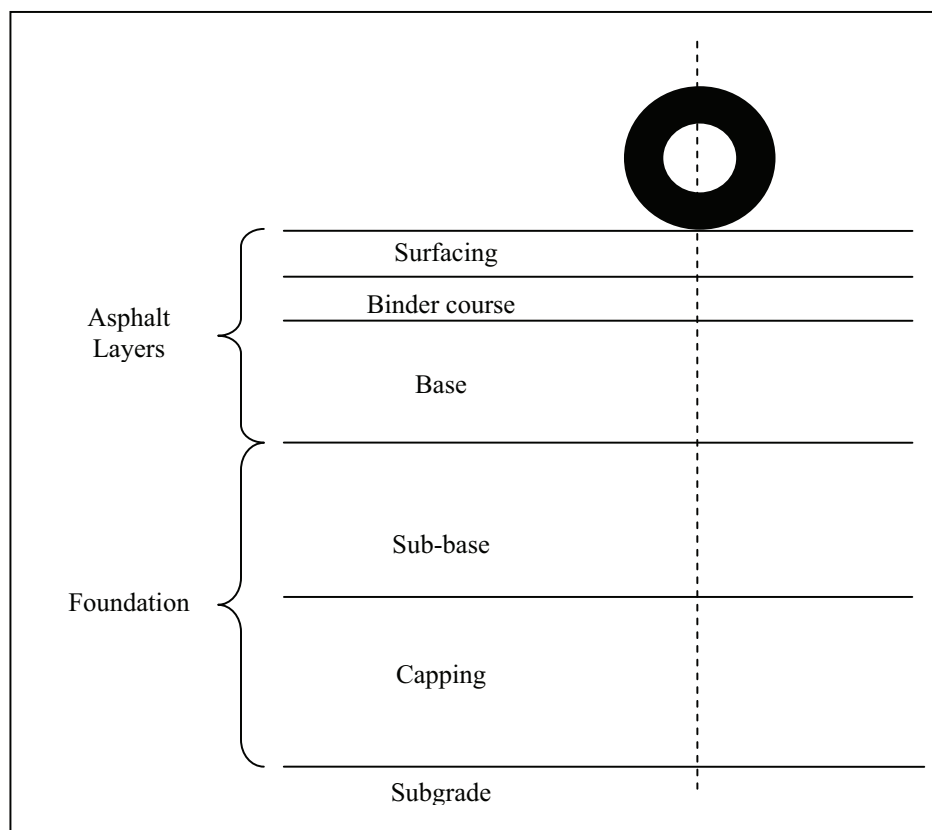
A typical UK asphalt pavement structure (Adapted from Read and Whiteoak, 2003)
